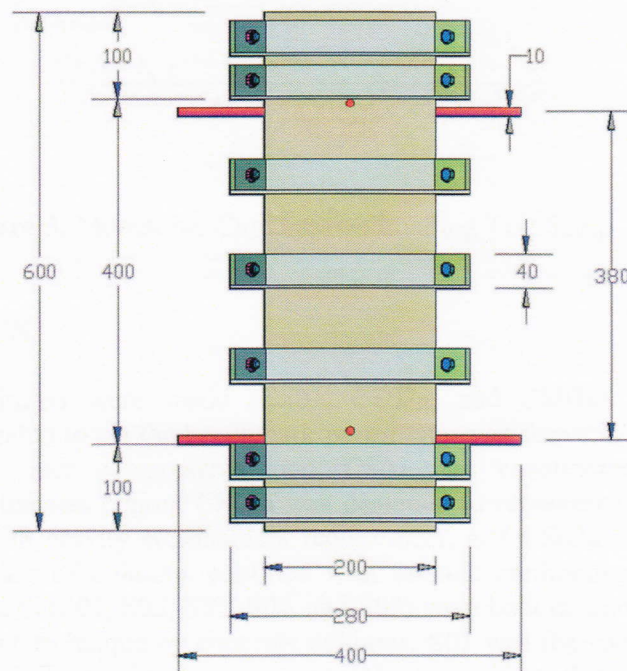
Typical Elevation View of Test Specimen (Specimen S03 as an Illustration)
